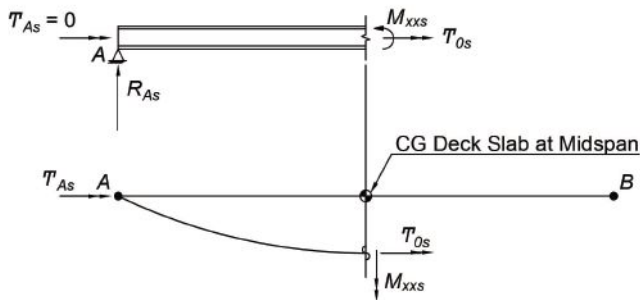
MECHANICS AT MIDSPAN-ELEVATION AND PLAN VIEWS
